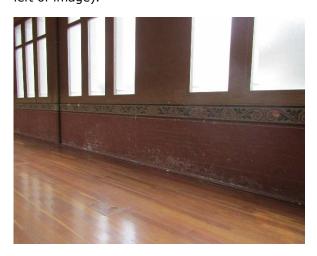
Walls are generally in good to fair condition, with some signs of wear and tear. The lower section of wall shows possible signs of water damage and salt efflorescence (further investigation needed).
